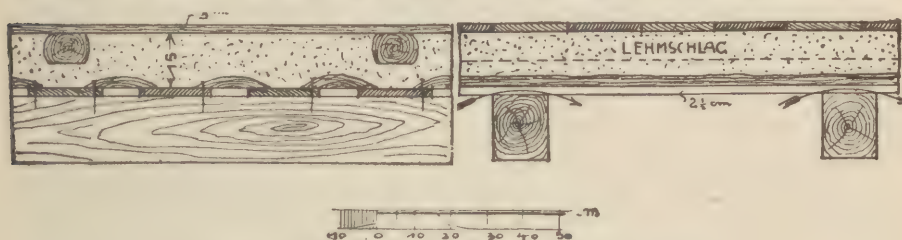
Wooden plank ceiling, according to Jammerspach.
